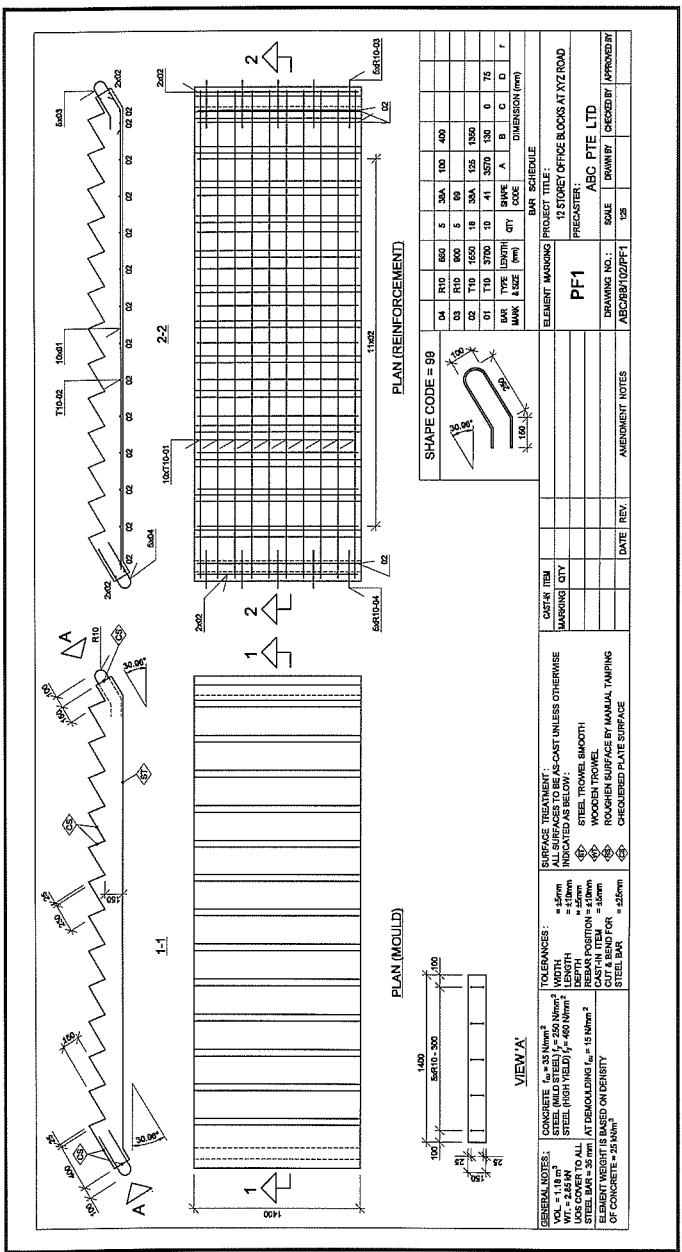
Mould And Reinforcement Details Of Precast Flight (12-Storey Office Block)
